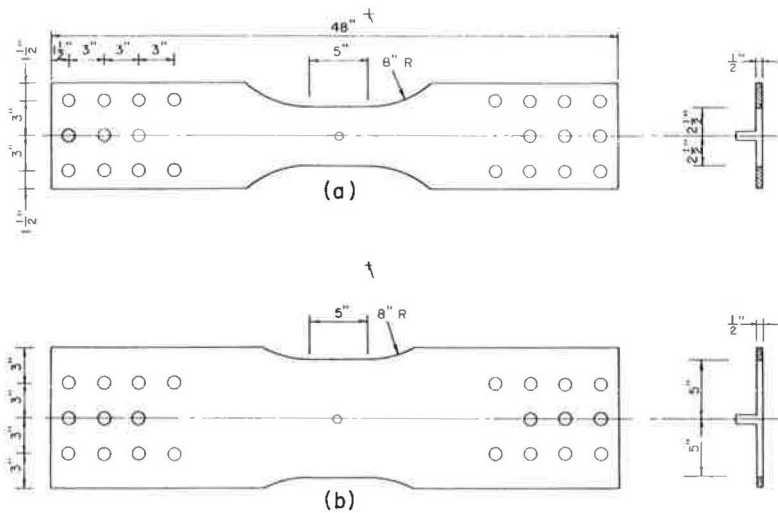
Dimensions of large plate specimens with a single stud: (a) GIC specimens, and (b) specimens GID1 through GID3.
